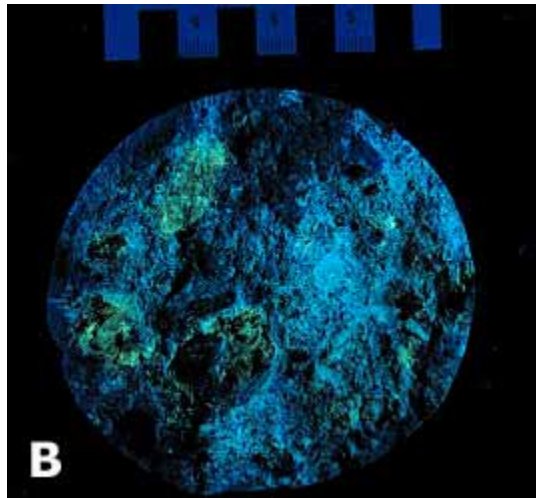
Specimen from retaining wall with destructive ASR treated with uranyl acetate: Ultraviolet illumination causes silica gel to fluoresce (darkroom photograph).
